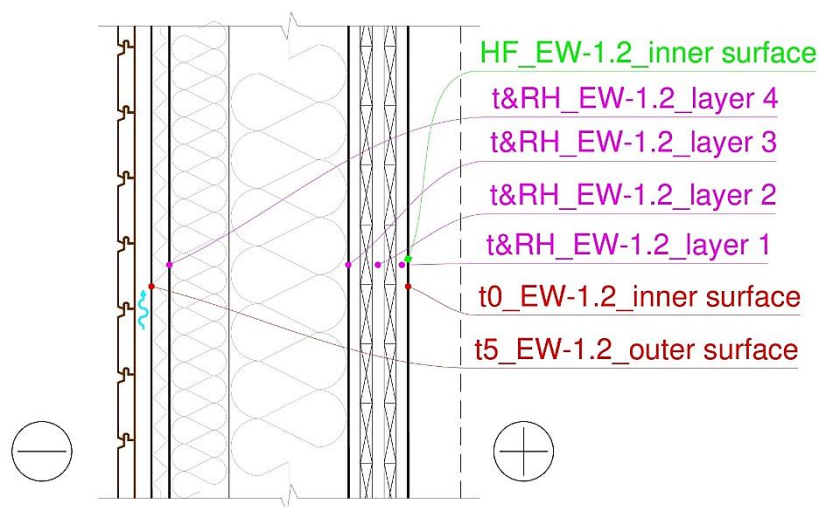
Example of sensor placement in a wall assembly (EW 1.2) (Technical drawing by V.Kukk, adjusted by author)
